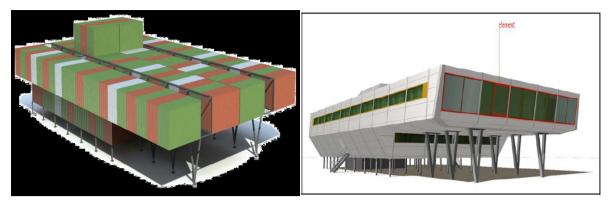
BASE STRUCTURE AND COLUMN OF THE BUILDING
